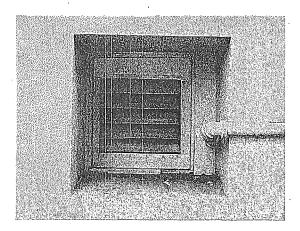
Detail view of punched opening infilled with a louvered vent at ground level (photograph taken on 01/26/2018).
